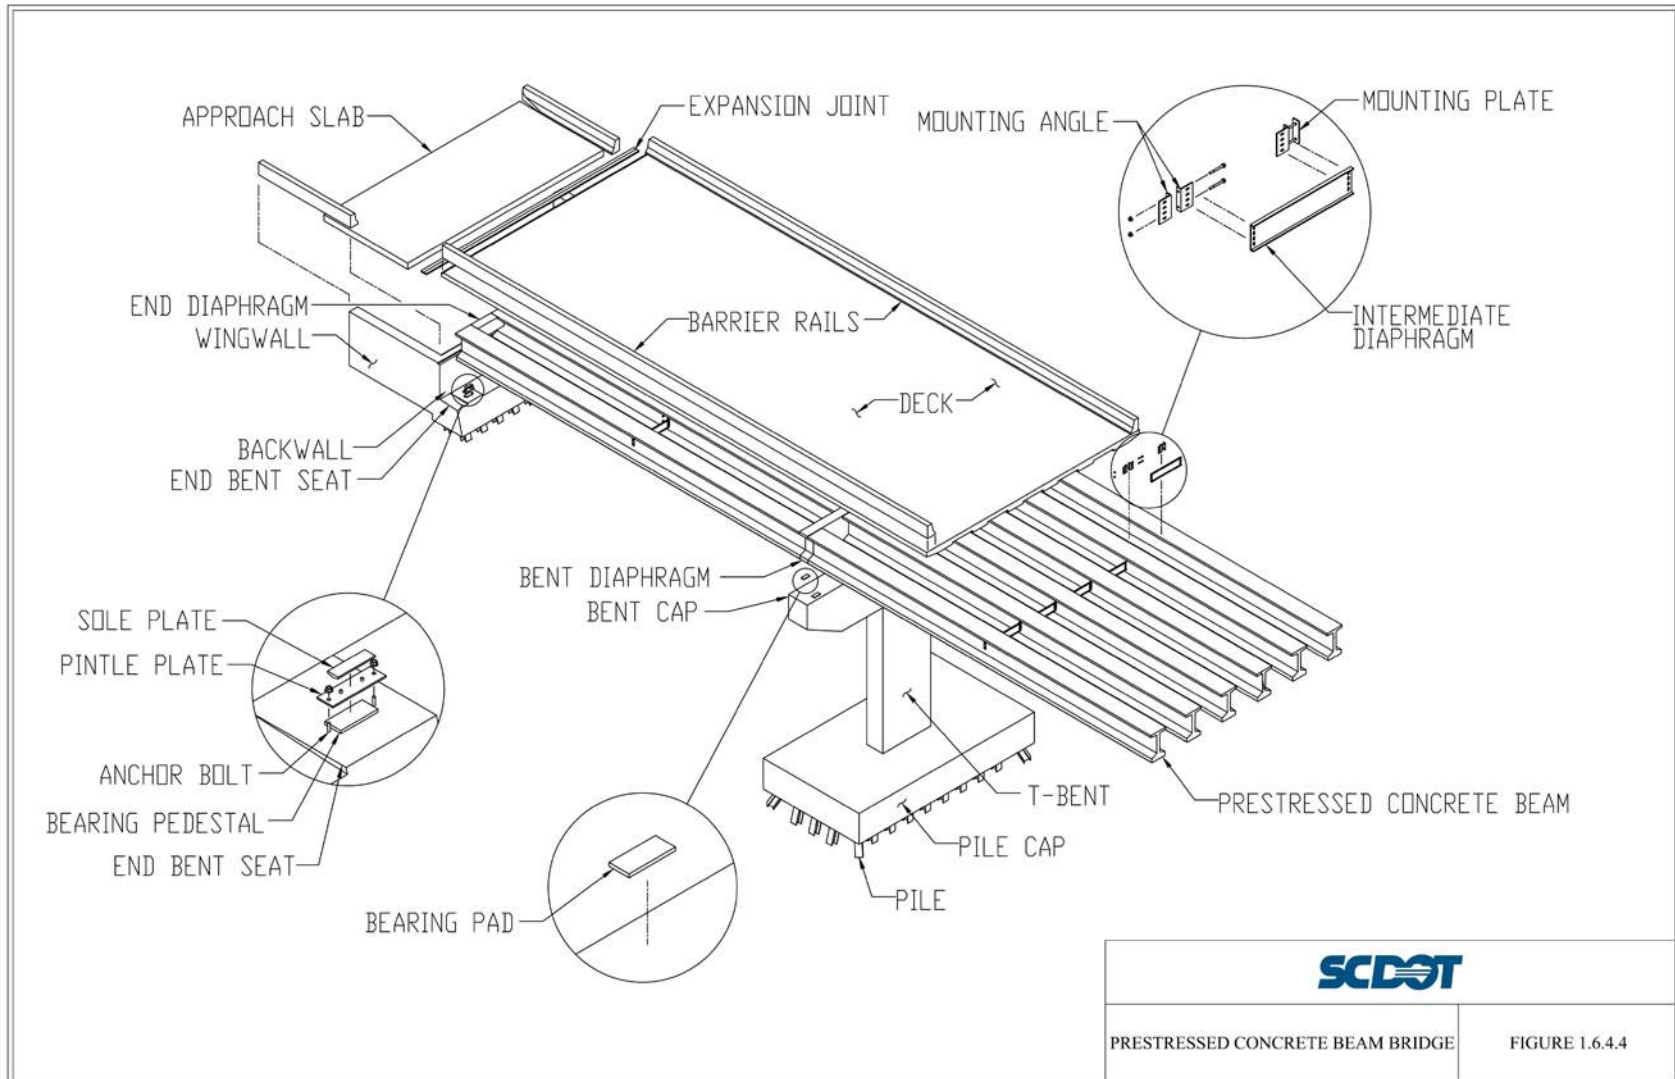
Prestressed Concrete Beam Bridge Components
